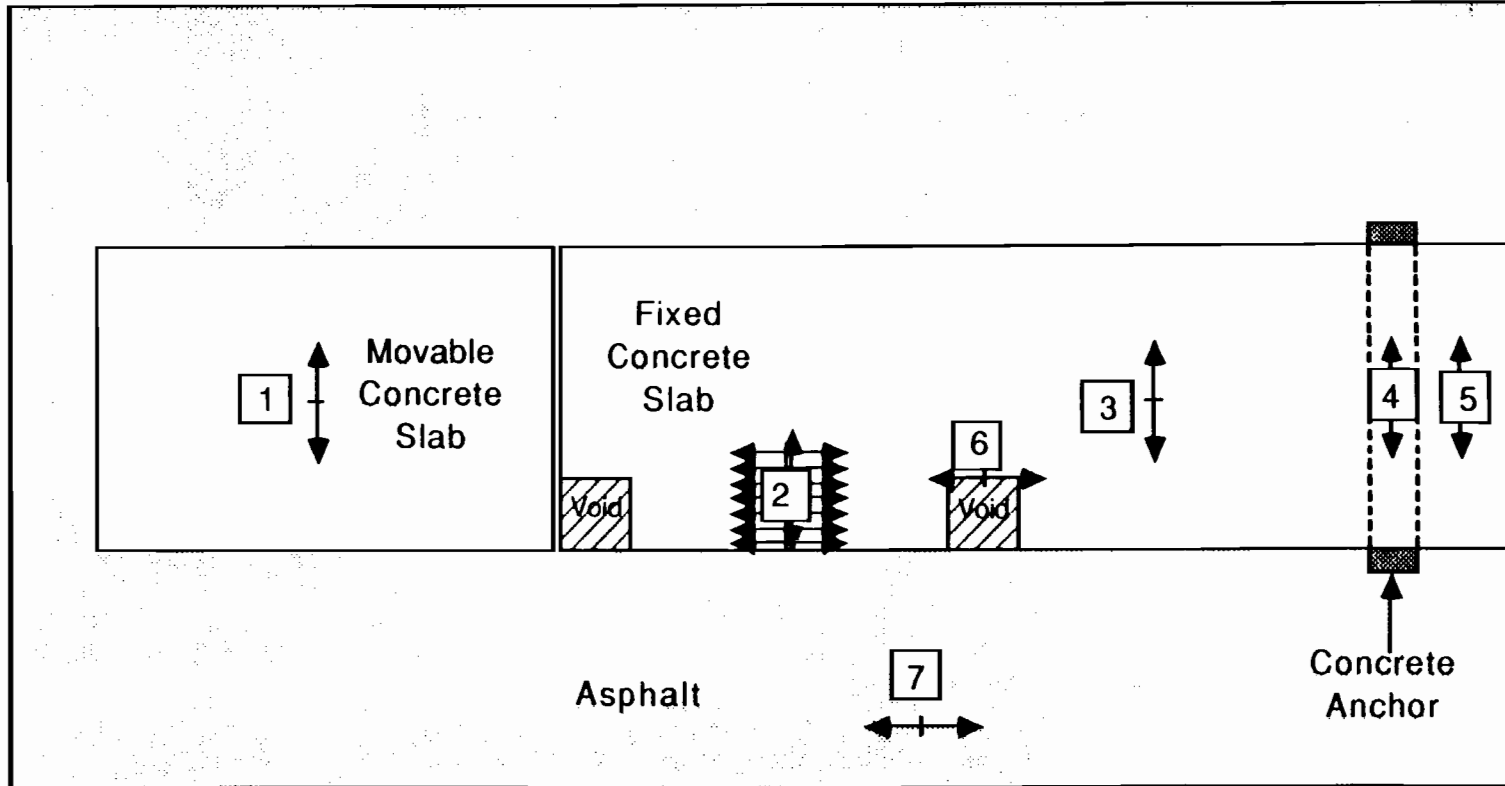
Plan View of SASW Test Locations at the BRC Facility.
